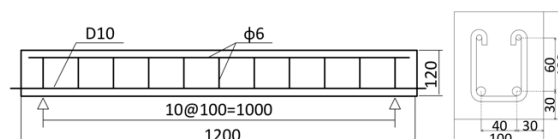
Reinforcement arrangement of RC beam (unit: mm)
